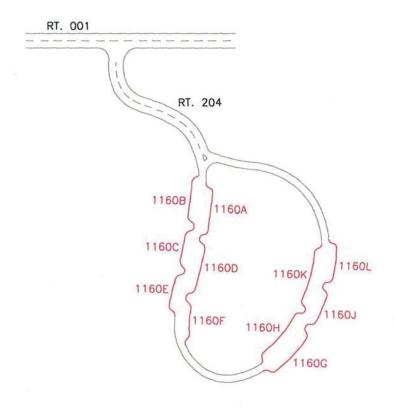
Parking with access route 204 and multiple parking areas (1160 A-L). Currently, this parking area is 12 routes and 12 assets (one 1100 asset and 11 1300 assets).
